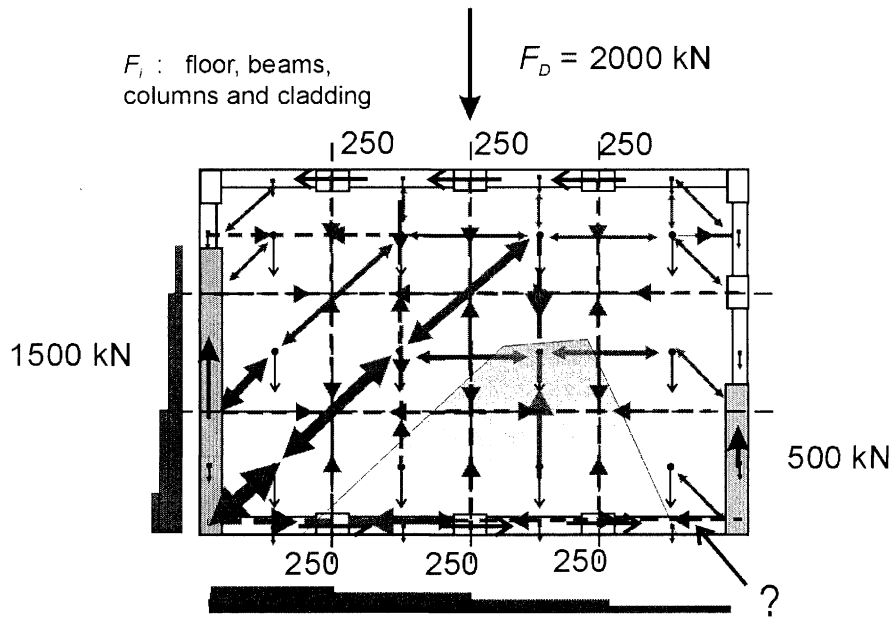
(b). Assumed inertia, wall forces and column forces on a floor.
